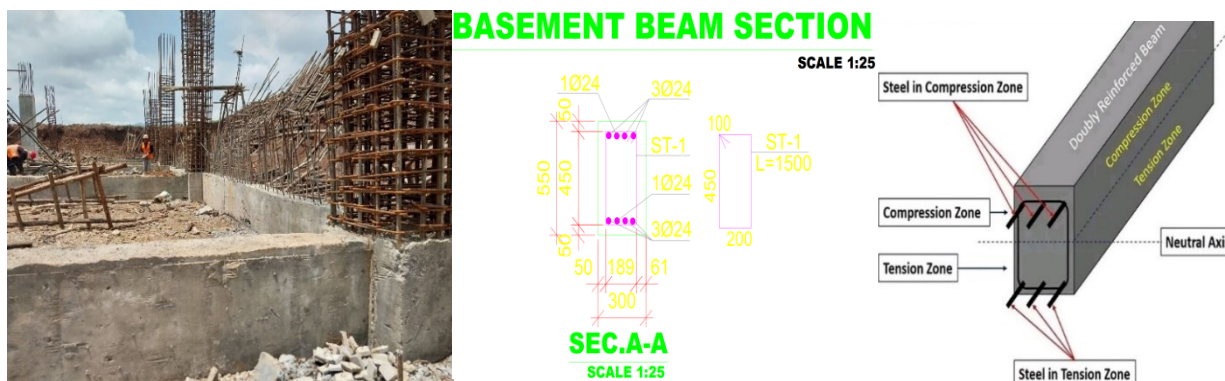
Typical doubly Reinforced BB Section of MHB & after construction.
